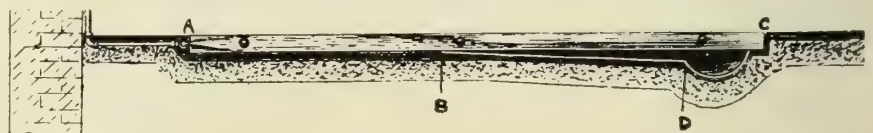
SHOWING SECTION OF CEMENT FLOOR AND SLATS
